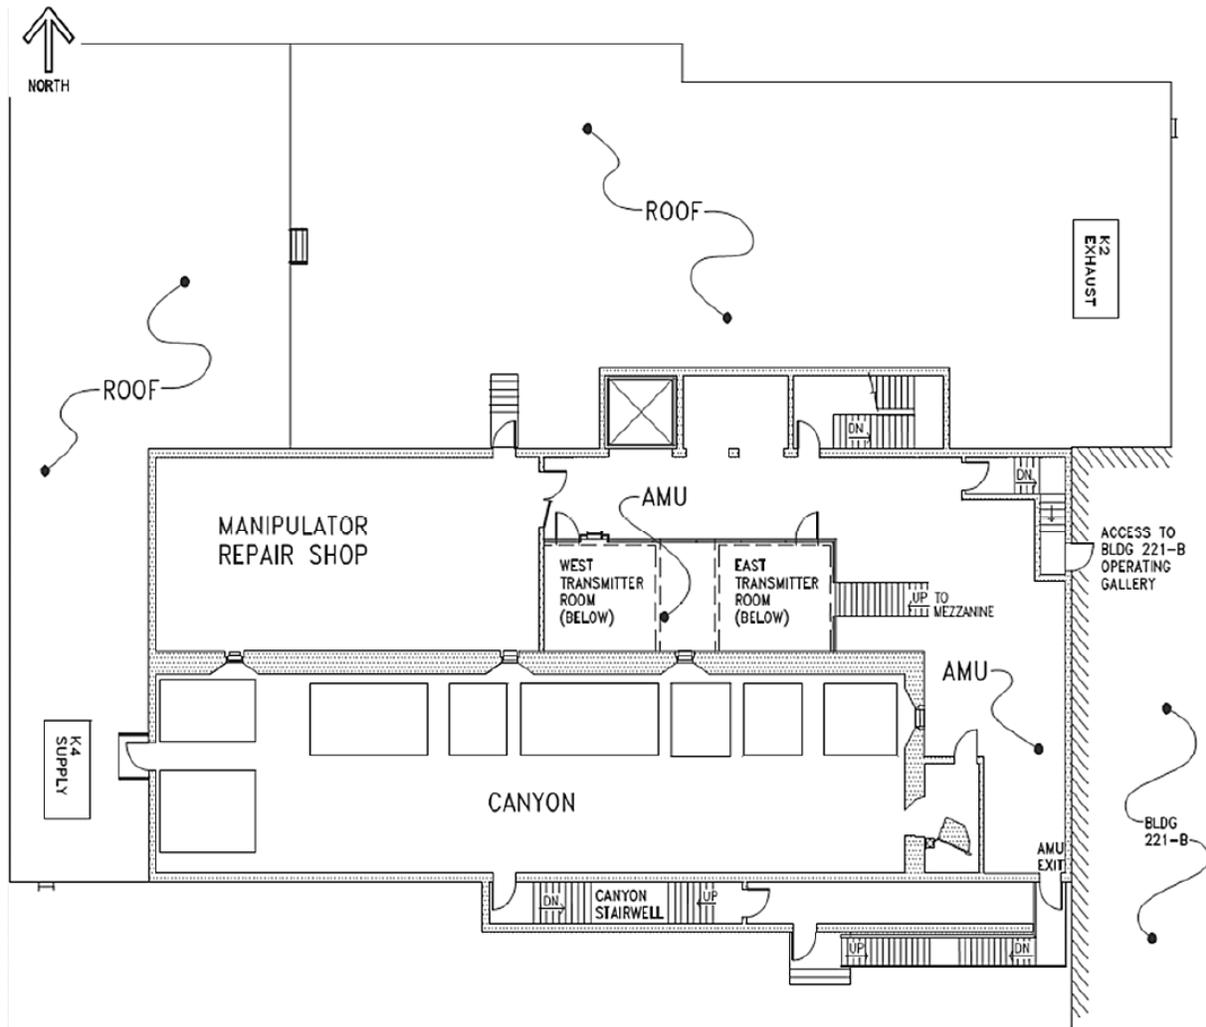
WESF Pool and Process Cells Building Layout (2nd Floor)⁴⁸
